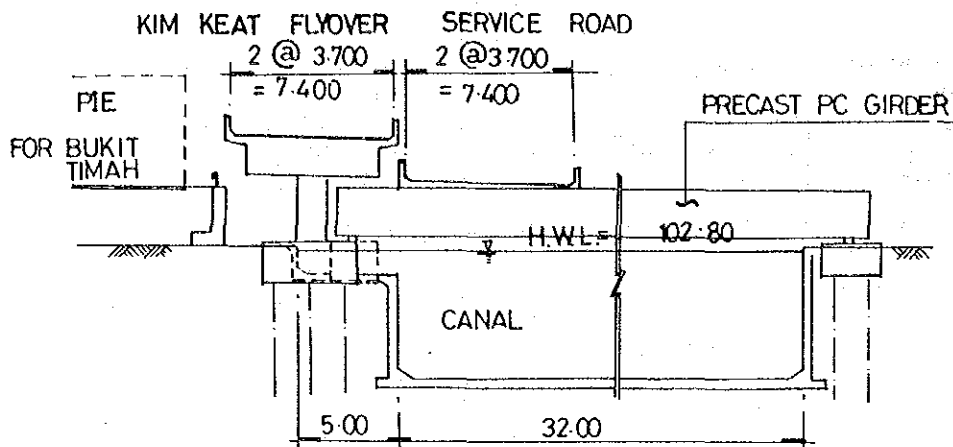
PIE Kim Keat IC : Widening plan by raising & bridge works
